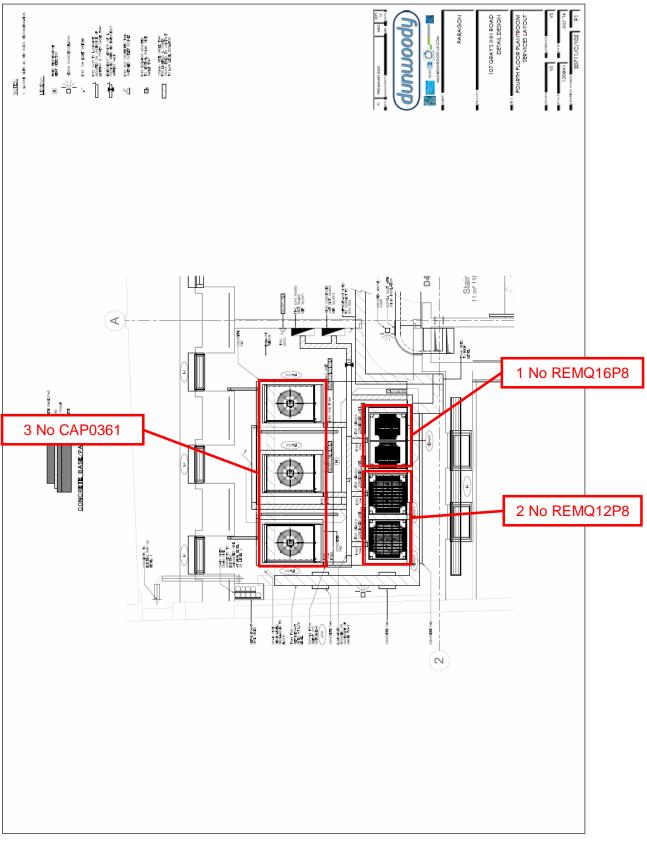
4TH FLOOR PLANT INDICATIVE EQUIPMENT LAYOUT
